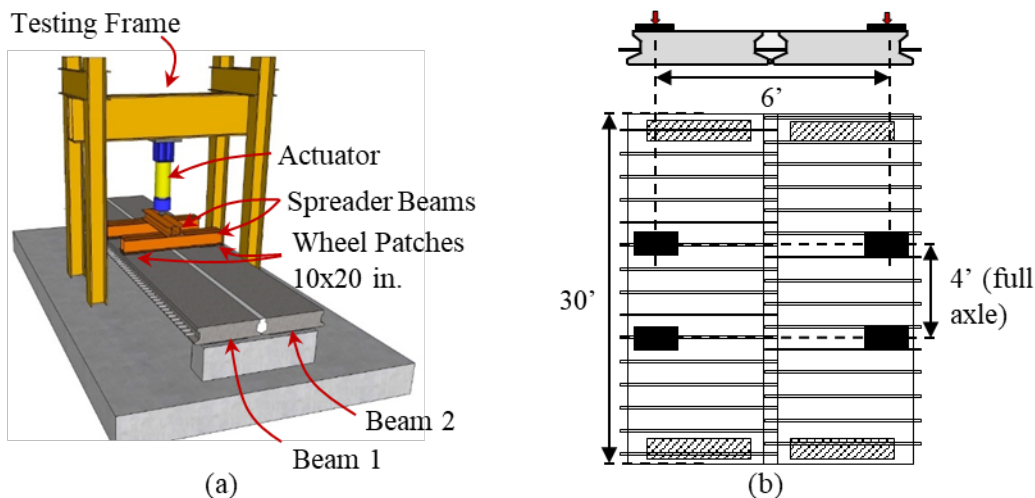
Proposed test setup for Load Configuration 2-4 (a) schematic and (b) plan and elevation views
